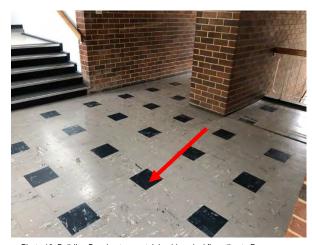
Building B, asbestos containing blue vinyl floor tiles to Room R1010
